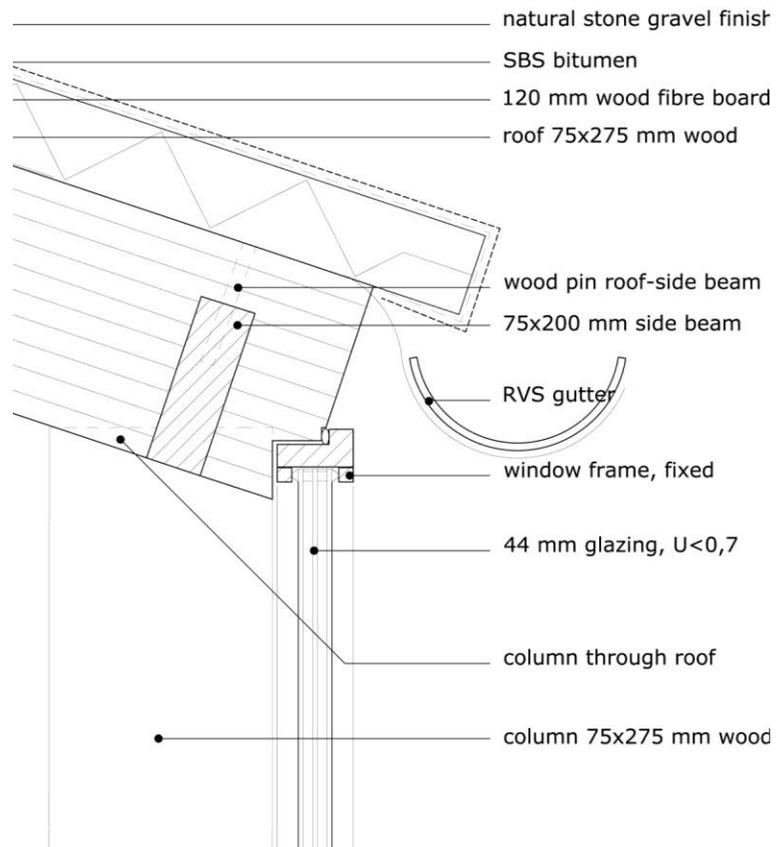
, massive wood connection from roof to wall, scale 1:20
